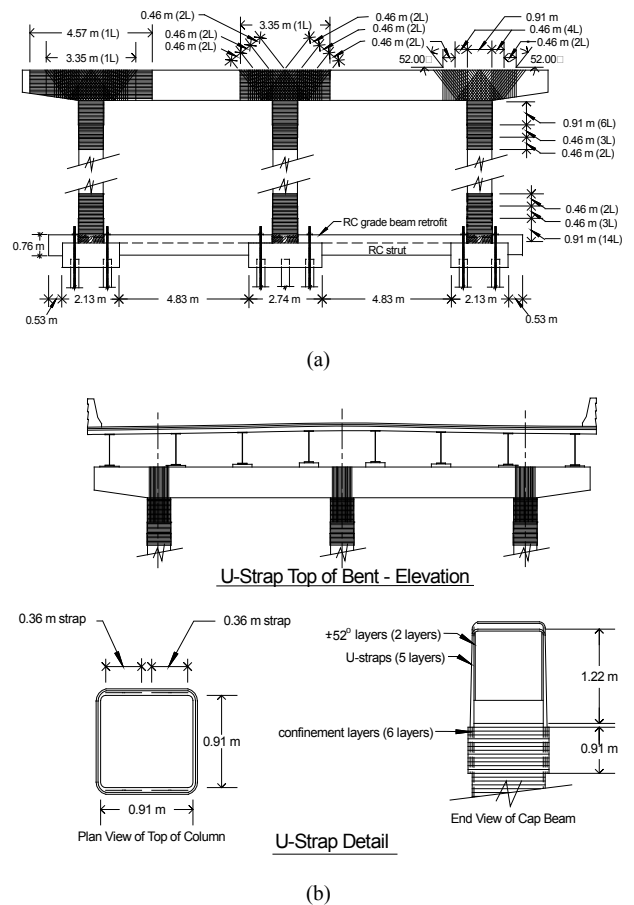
CFRP composite retrofit design of typical bent at South Temple Bridge: (a) ankle wrap, zero layers in the cap beam and column jackets, (b) U-strap details (xL = no. of layers)
